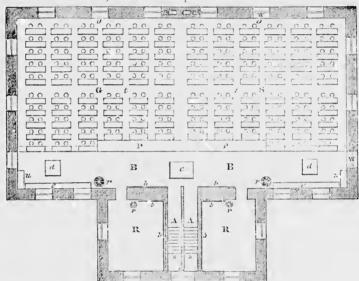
Plan of the Second Storey, adapted to Design No. 31.
